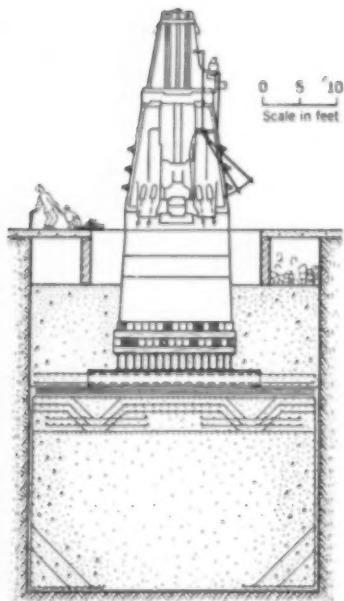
In conventional foundation for 55,000-lb die forging hammer, anvil rests on timber pad over concrete block. This is a British setting for drop-hammer installation.
